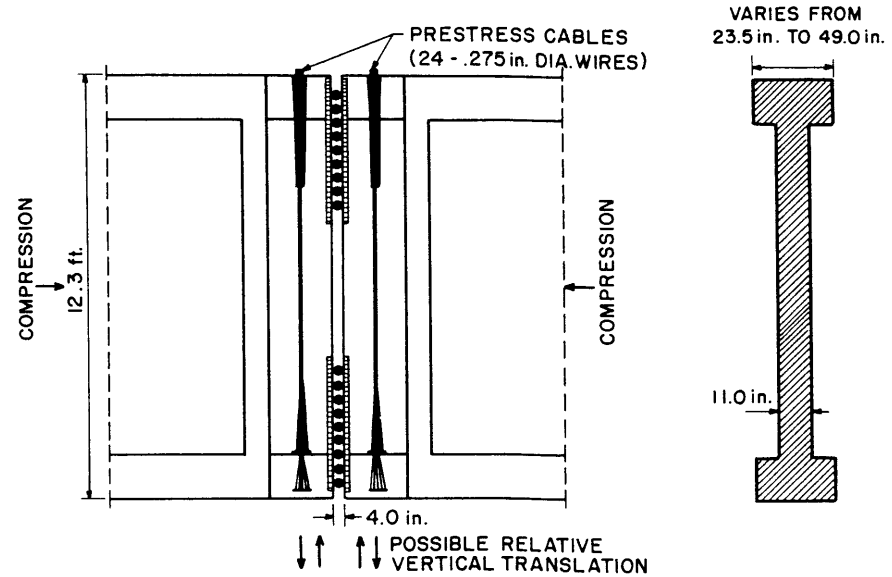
ARRANGEMENT OF ROLLERS AT JOINTS BETWEEN SECTIONS OF THE CROWN WALL.
